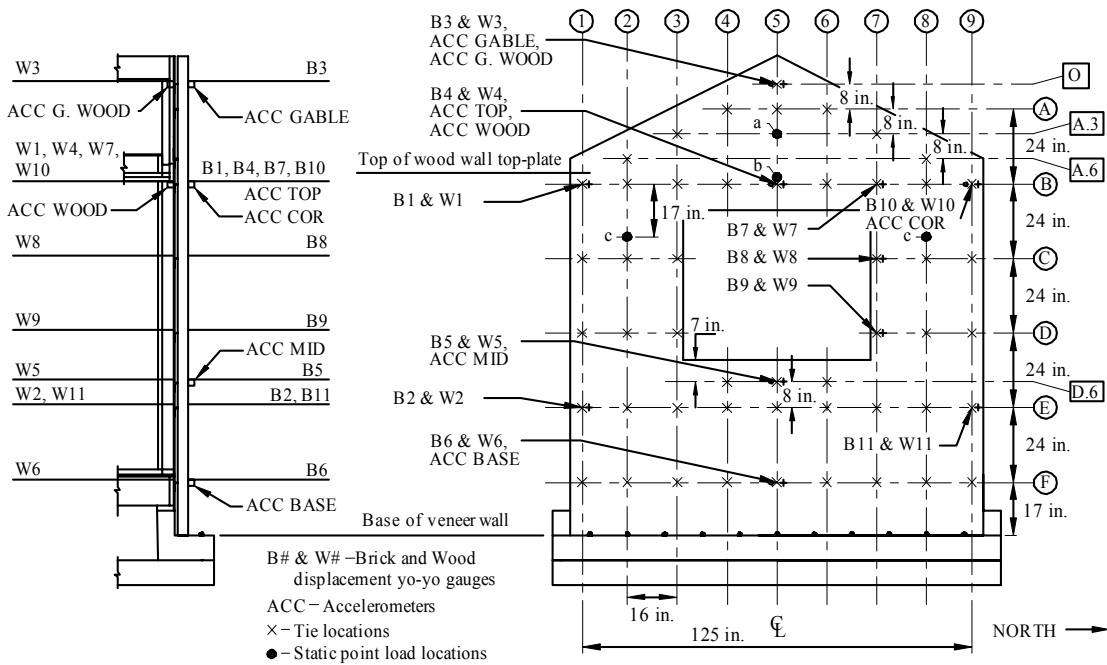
Wall-3 specimen instrumentation, static point load location, and tie grid layout.
